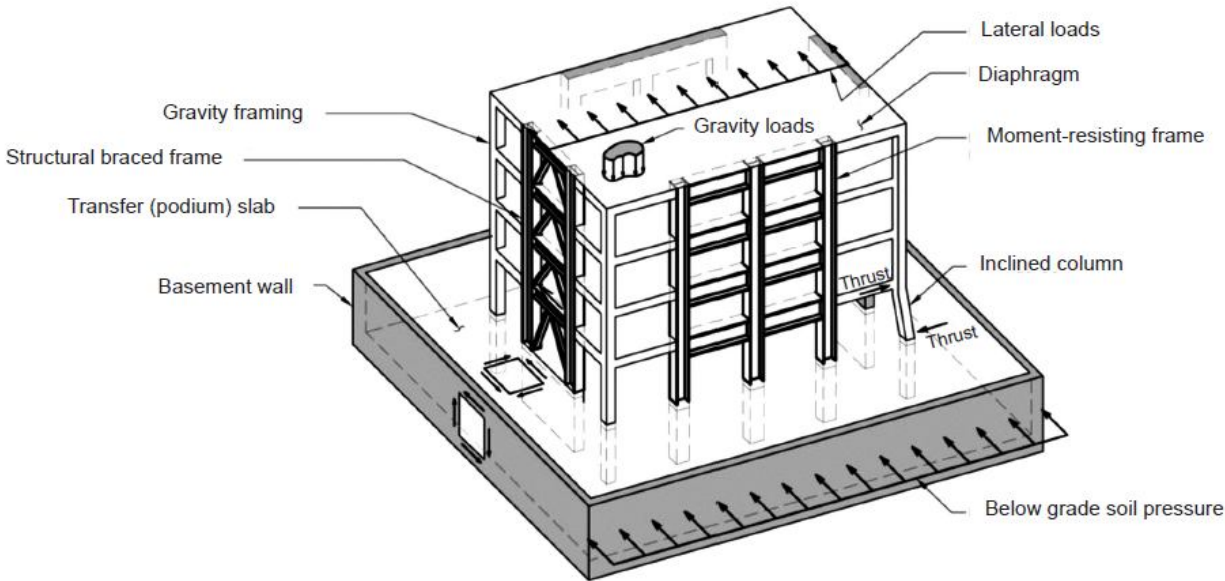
Roles of Floor and Roof Systems [from Sabelli et al. (2010)]
